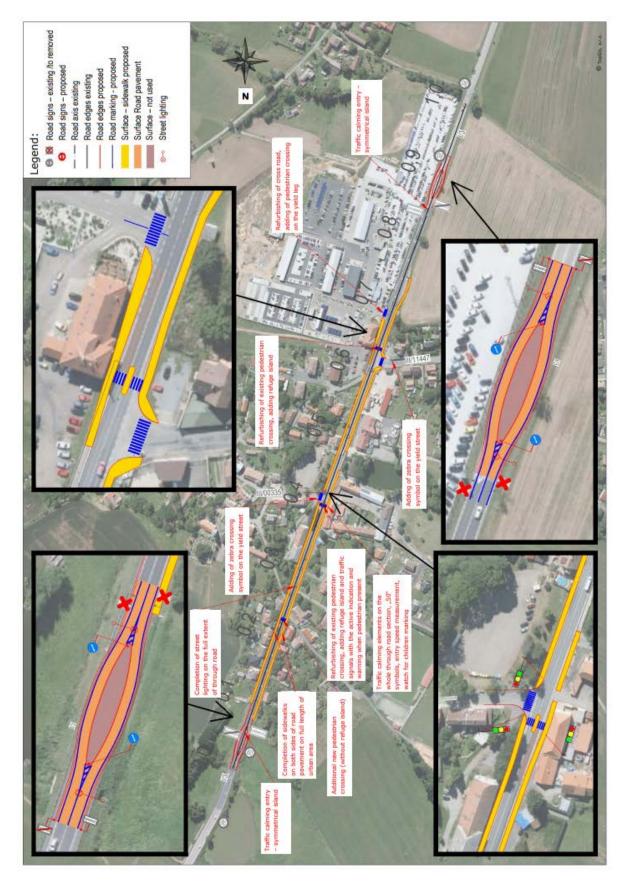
Full extend of through road section. Proposed safety upgrading countermeasures – road marking and sidewalks (standard mandatory signs are not shown)
